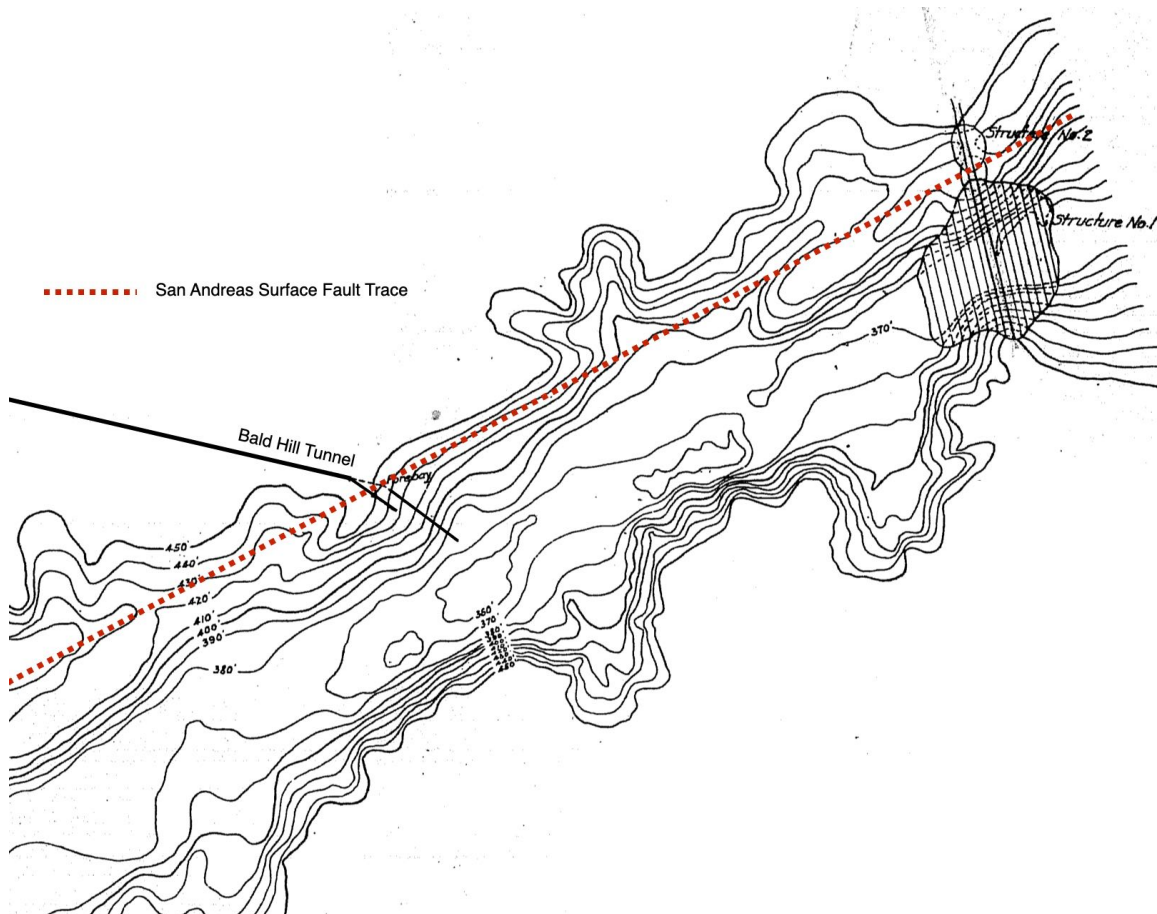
Survey of Outlet Works, 1983 (adapted from Pampeyan 1983)
